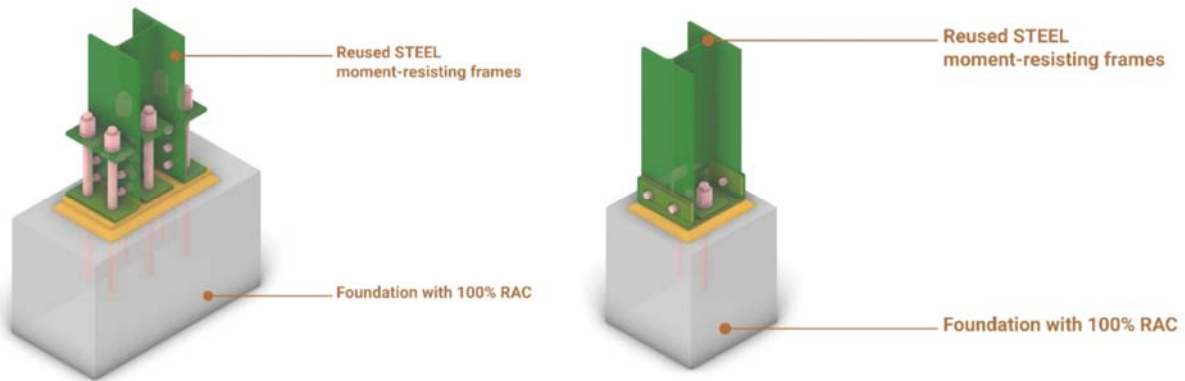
Steel column and concrete foundation connections initial design
